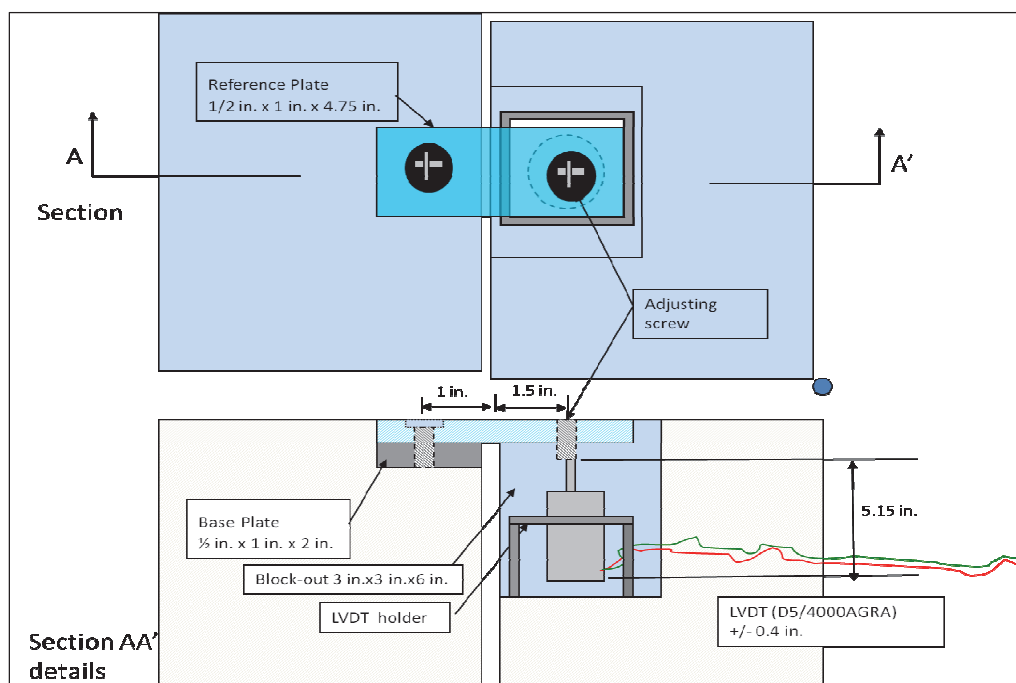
Installation of a joint deflection gauge – concrete block-out and gauge mount.
